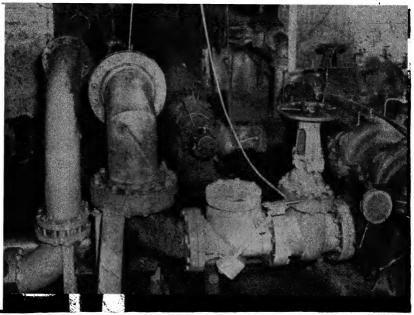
Installation of rubber-lined pipe to carry acid-laden water out of a coal mine.
